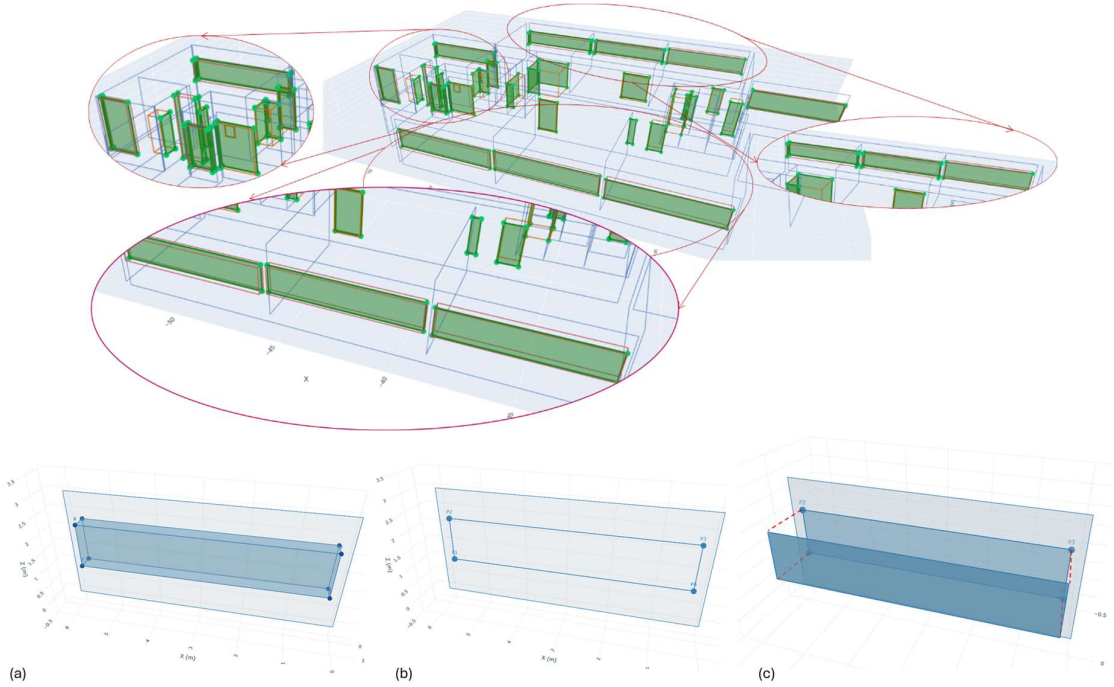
Opening creations: (a) intersection points between wall surfaces and openings oriented bboxes (OBBs); (b) opening cut in the main wall surface; (c) opening surface creation.
